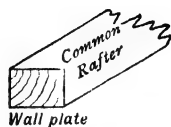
Bird's-mouth Joint at Parapet Wall.
